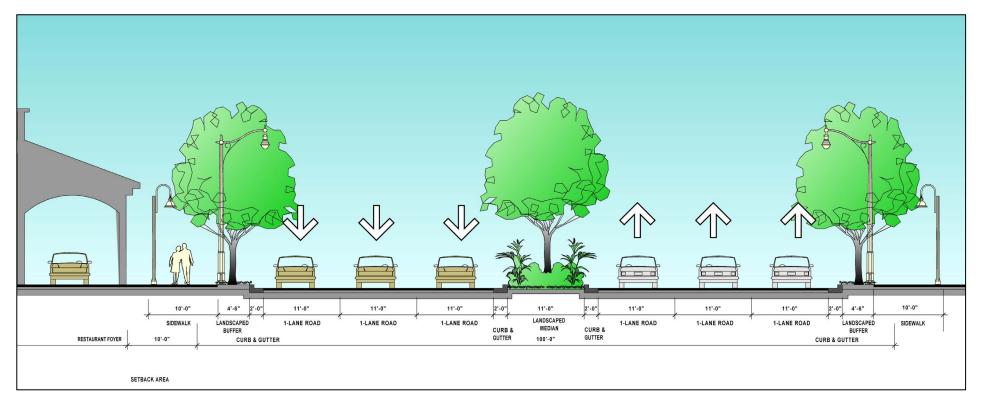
Recommended Typical Section on the IFK Causeway in North Bay Village
